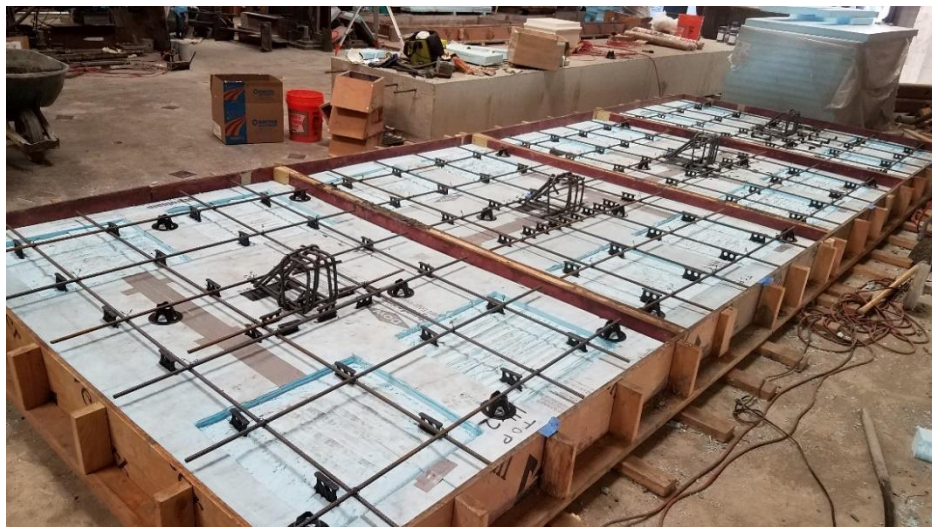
Concrete specimen formwork and rebar for Set 2
